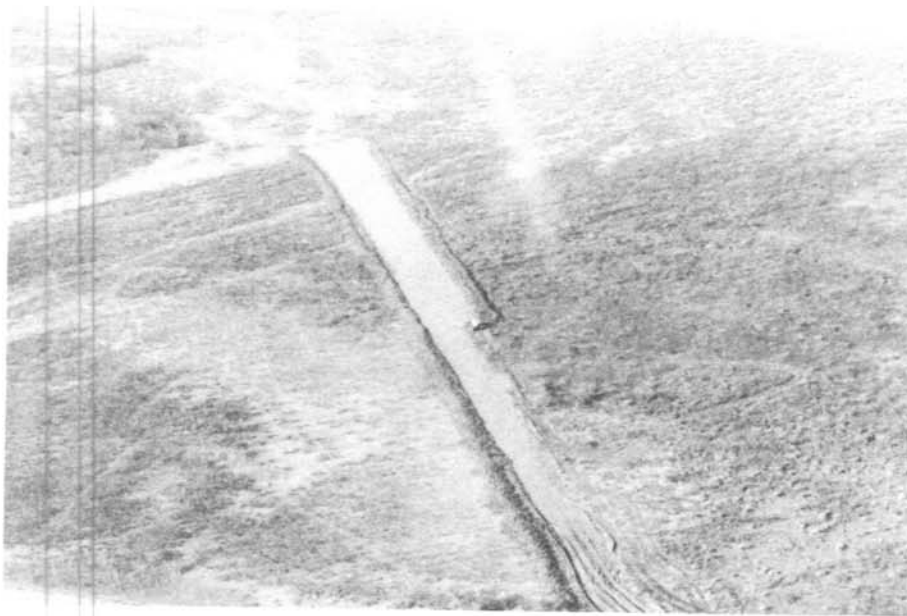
Looking downstream upon pilot channel excavation in the Elephant Butte Reservoir delta. 11/28/90
